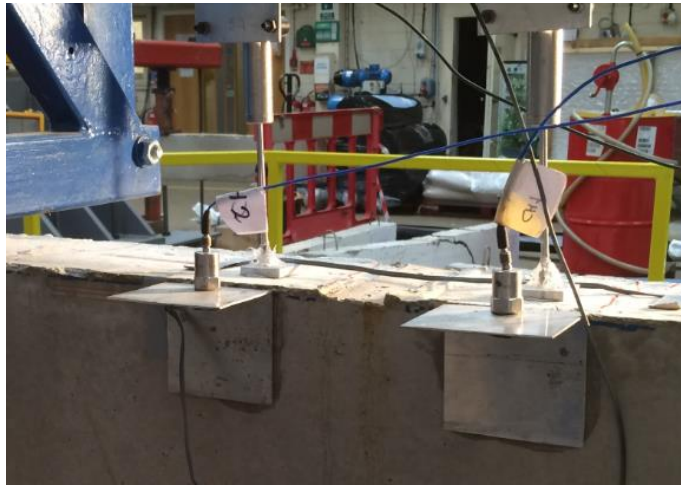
Arrangement of accelerometers (Ch1 and 2) placed on RC specimens
